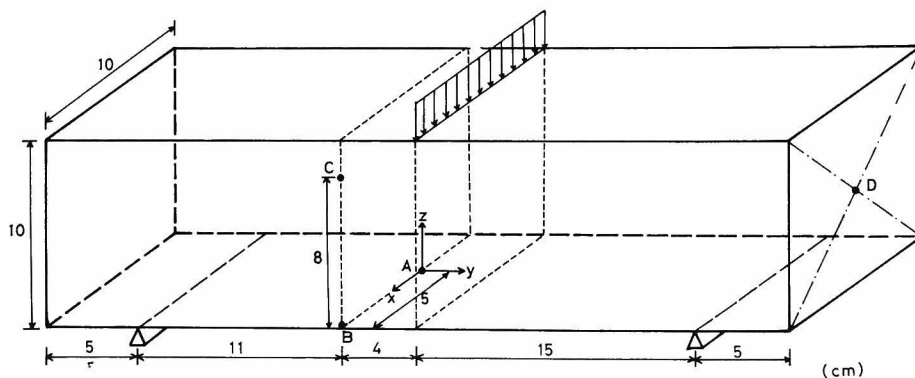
Reinforced concrete beam model and location of transducers.
